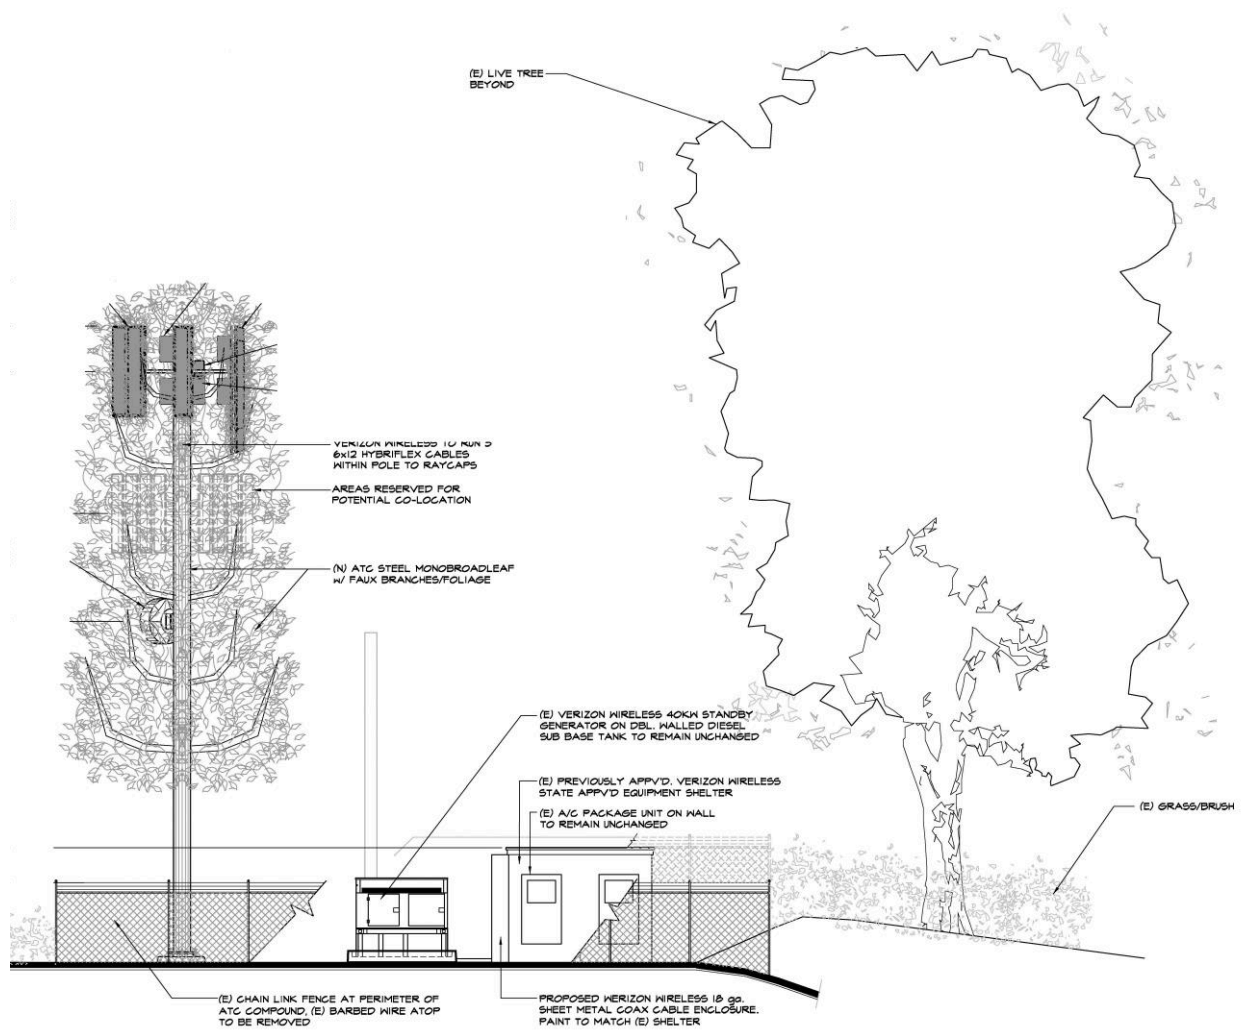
Proposed mono-broadleaf facility, existing 10-foot tall CMU equipment enclosure and emergency generator.
